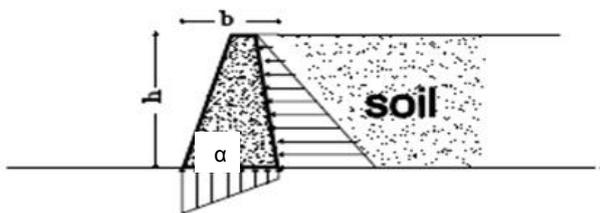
Show the Trapezoidal Shape of Retaining Wall
